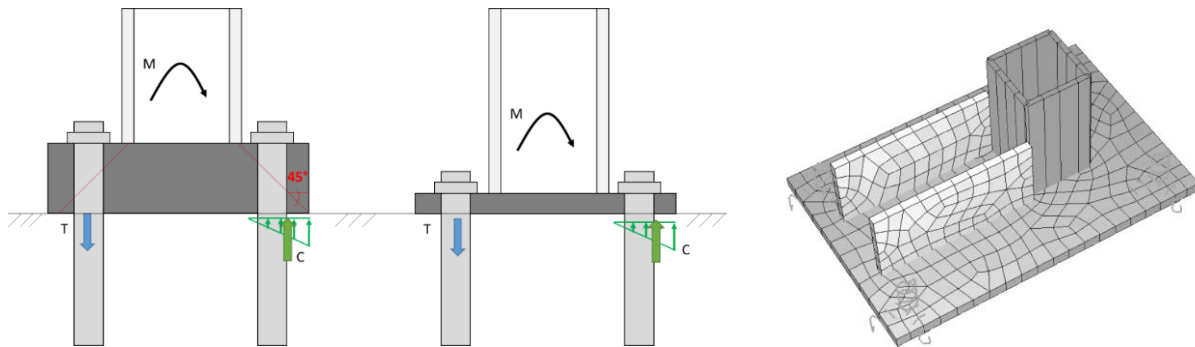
Left: Obviously sufficiently stiff anchor plate; Centre: Anchor plate with common dimensions, Right: Example of stiffened anchor plate in FEM
